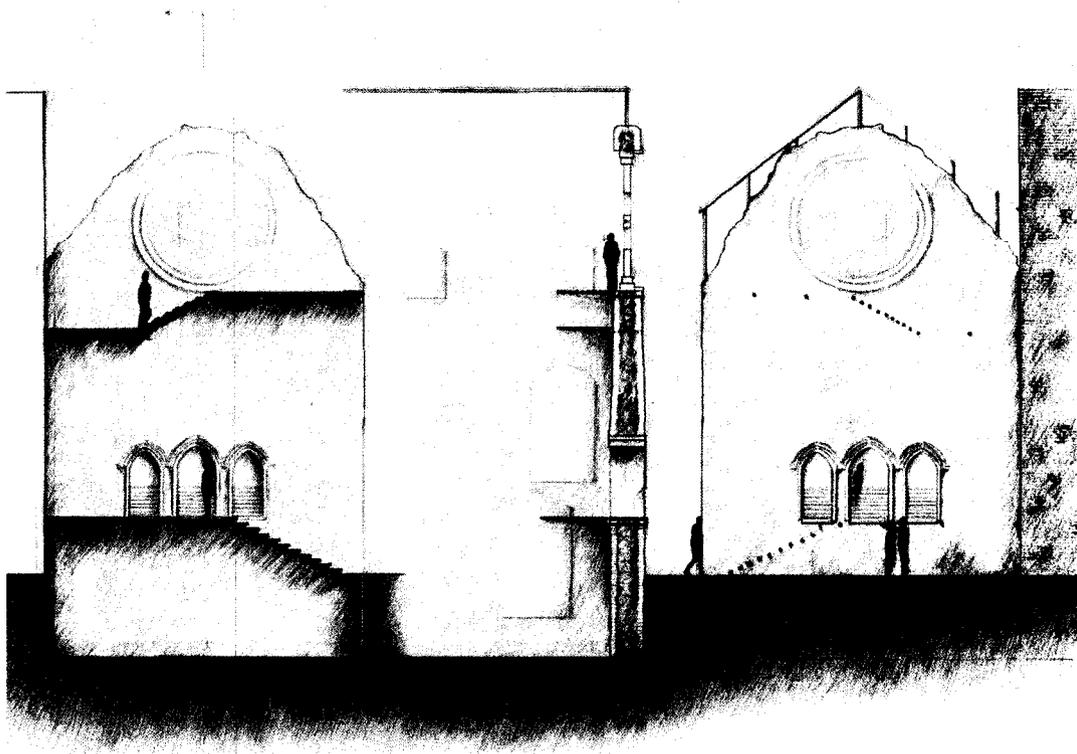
Drawing of reading spaces attached to a wall fragment. From left to right: Interior elevation, section and exterior elevation. Refer to Appendix B for full image.
